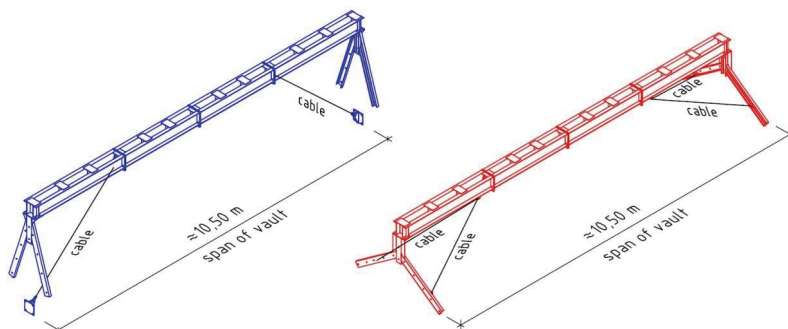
St. Barbara's church. Beams with cables to be placed in axes of ribs and over the lunettes of vault.
